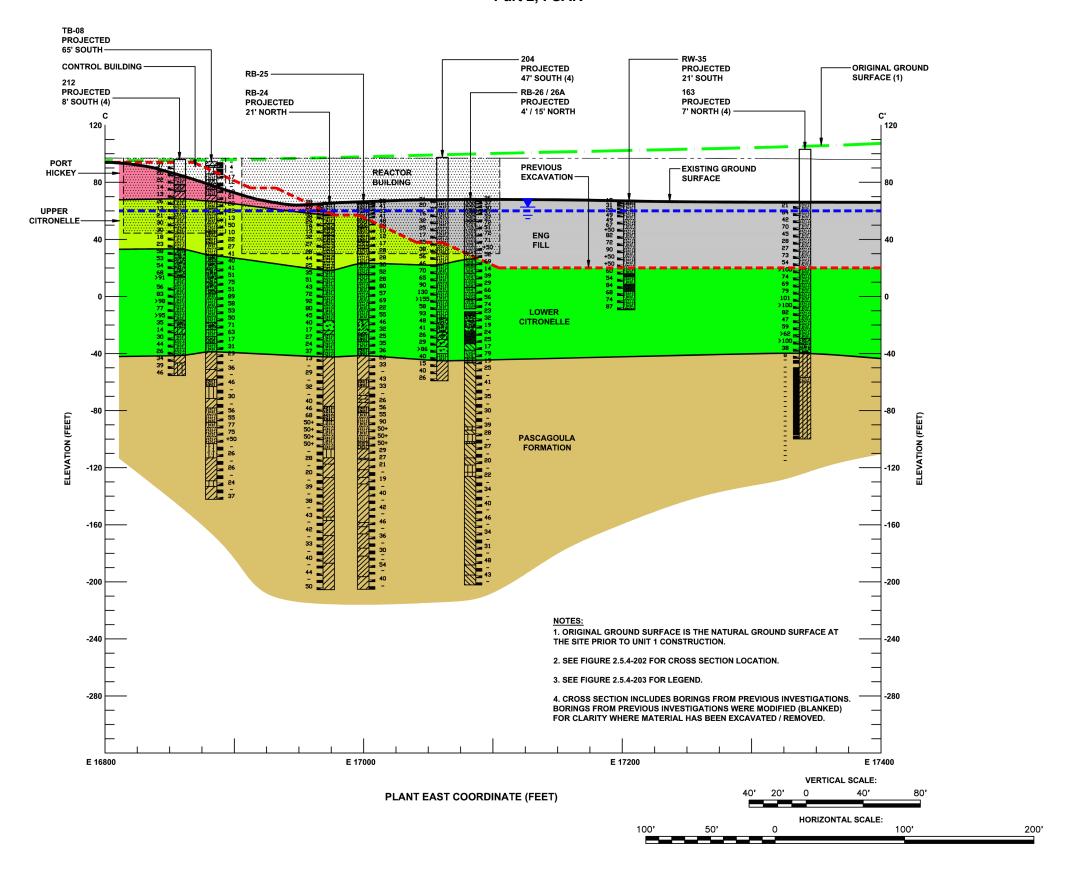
Cross Section C-C' Through RBS Unit 3 Site Location
